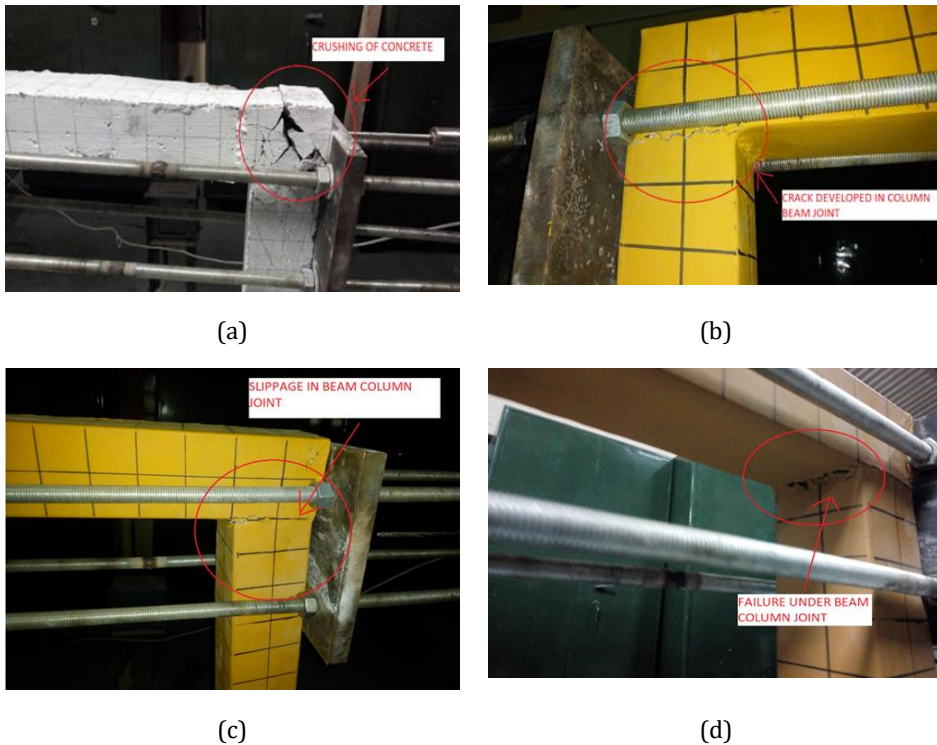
(a) Failure of bare frame, (b) Failure of SP-75 (c) Failure of SP-100 (d) Failure of SP-125
